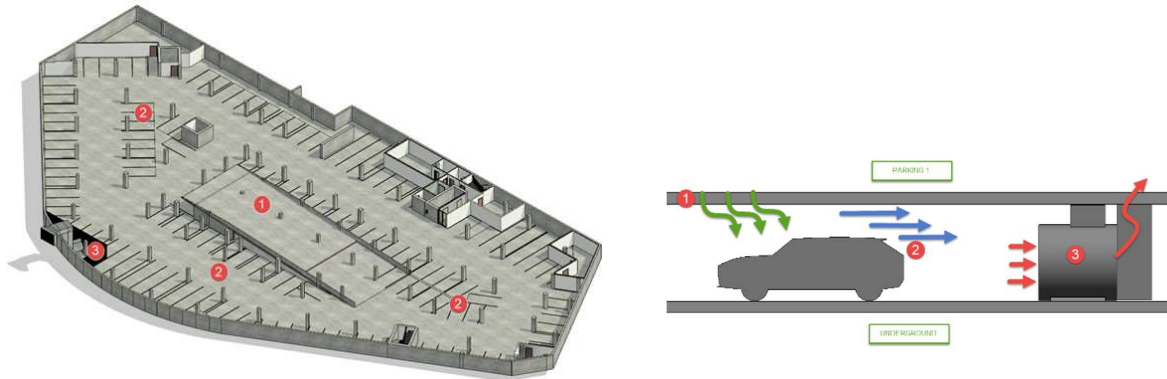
Parking Garage Ventilation Concept - Featuring a Single Exhaust Fan
